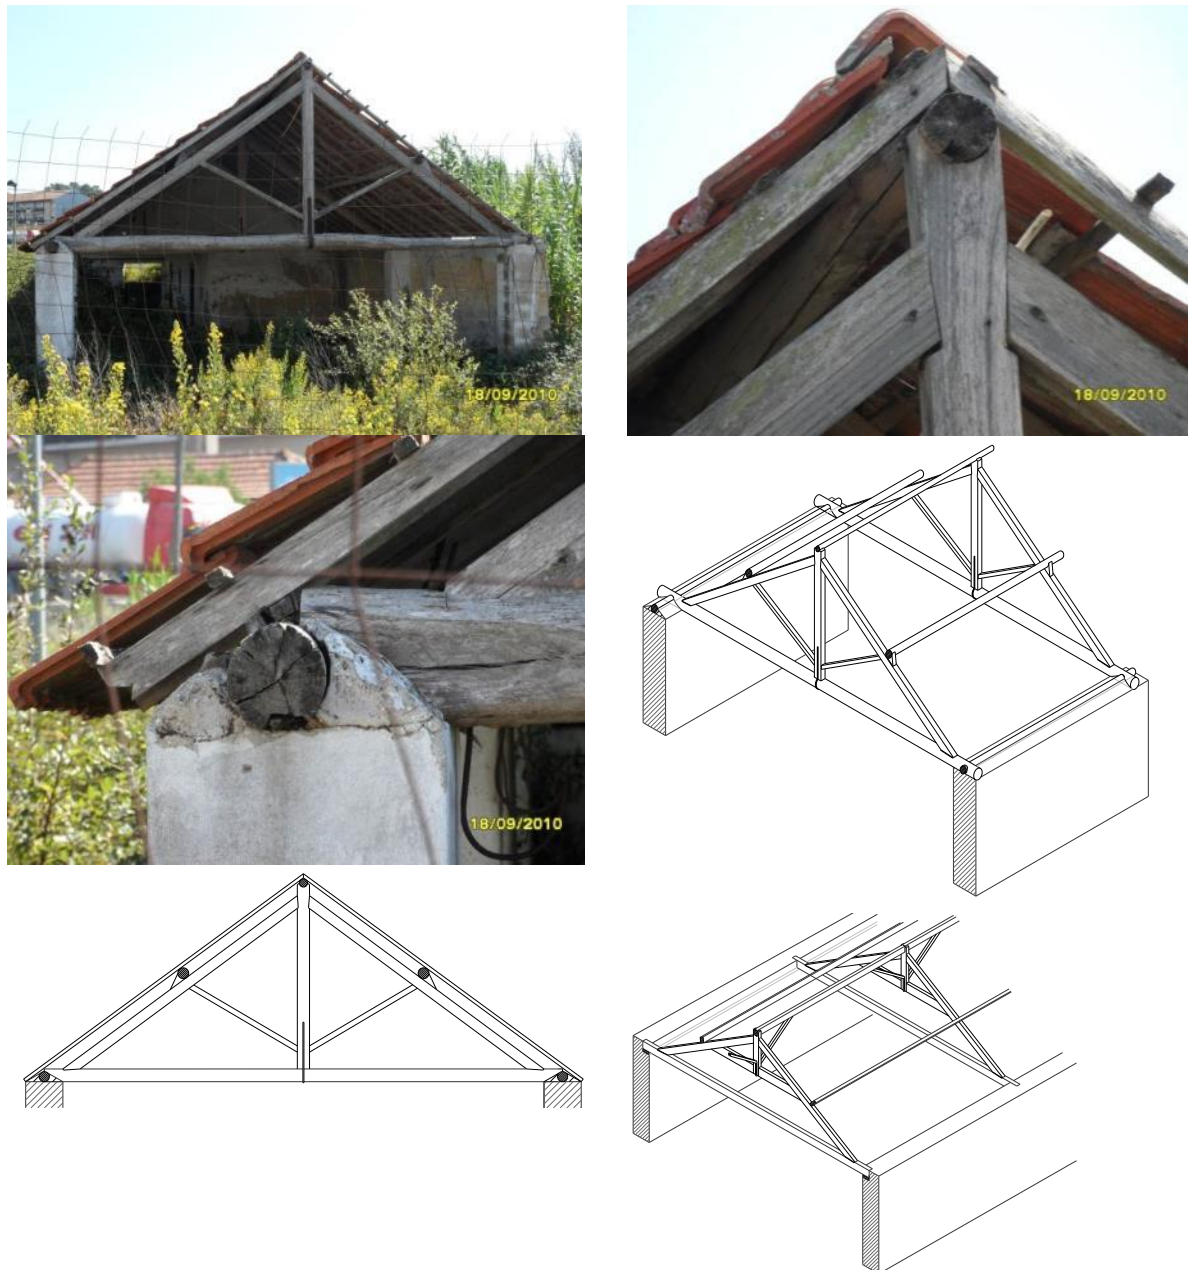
Solution KP - example of a king-post truss and example of longitudinal struts to help bearing the apex [credits Alice Tavares]
